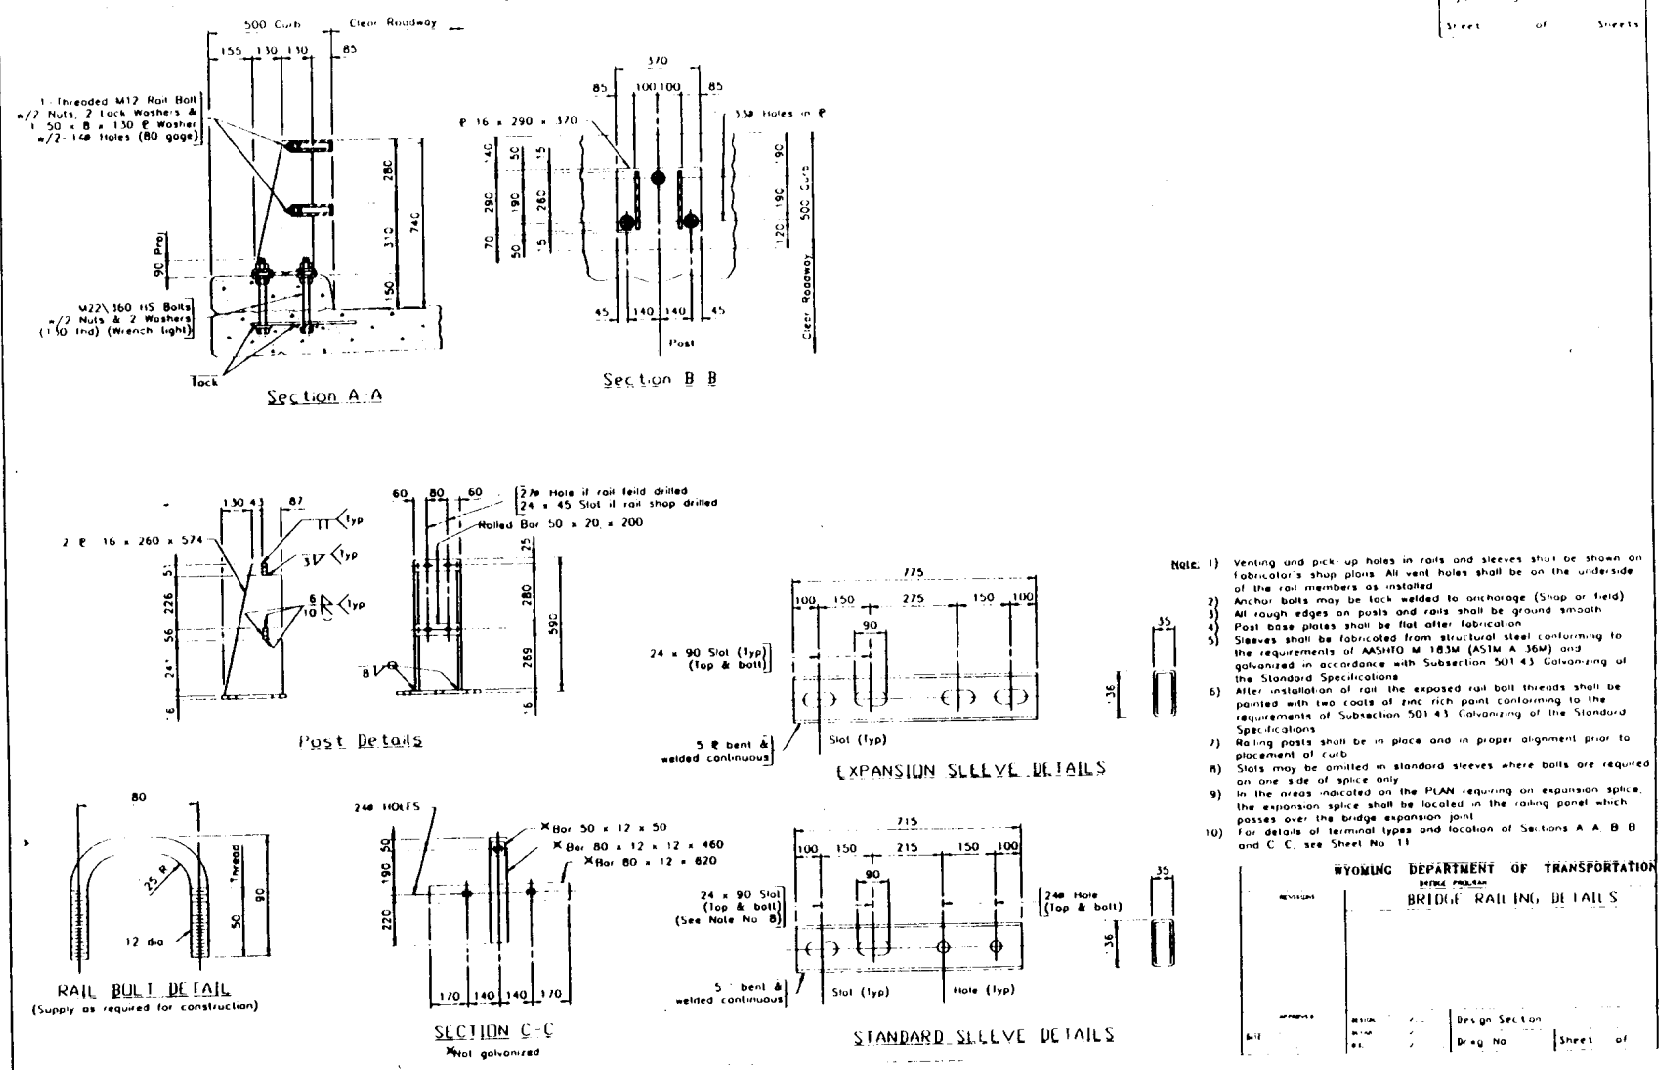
Details of the Wyoming 740WYBRAIL bridge railing design.
